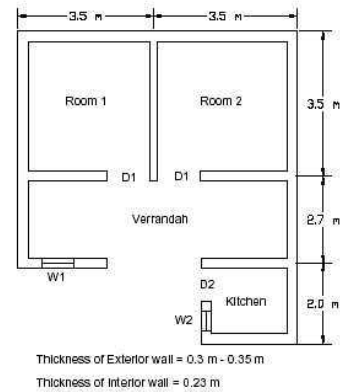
A: Typical Plan of a Single-story Residential Building, Kuchh and Rajkot Districts, Gujarat (Source: IIT Pow ai 2001)
